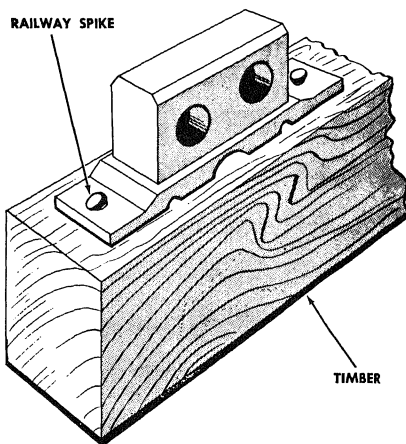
Crib bearing spiked to timber sill to provide fixed bearing.
